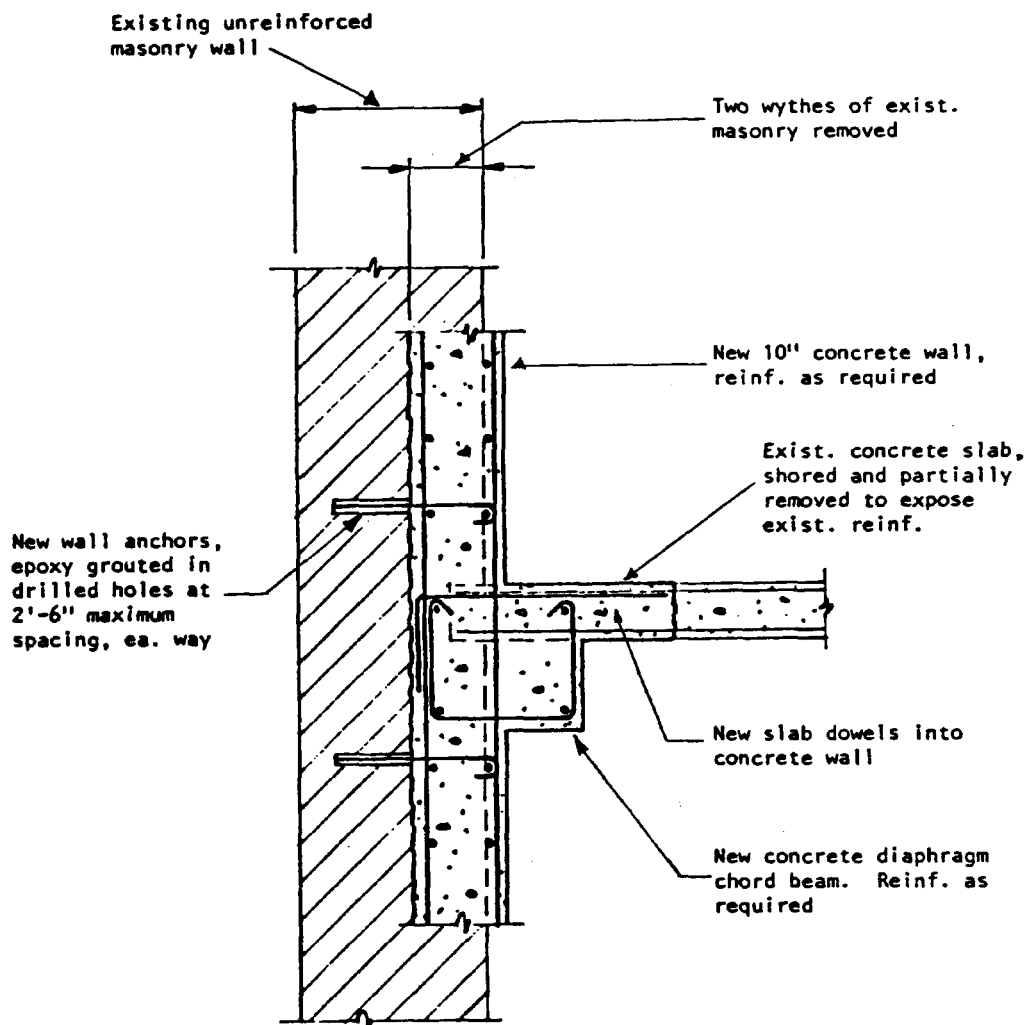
Strengthening of existing unreinforced masonry walls or piers
